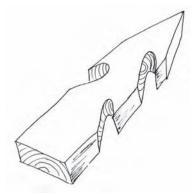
Barbed timber peg to be hammered into the straw bale wall
